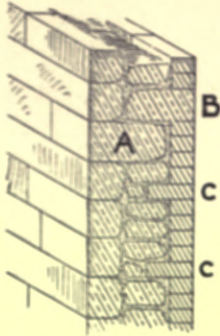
Wall with Ashlar Facing, Brick Lining, and Rubble Hearting.
